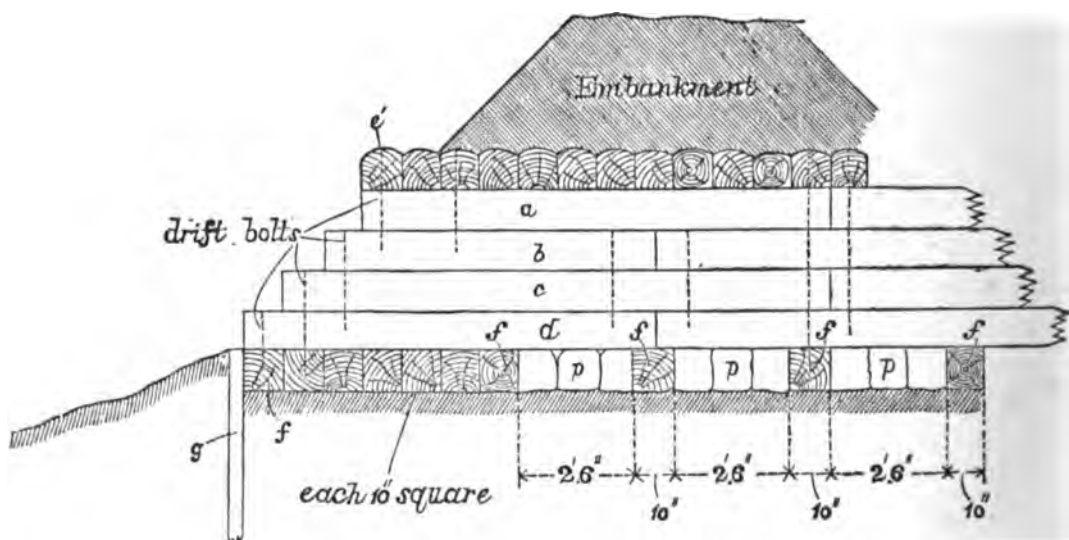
is a part end elevation, and figure 118 part longitudinal section of a timber log culvert used on the Canadian Pacific Railway. The sides of the culvert are made of logs 10 inches square in section, a and c are 12½ feet long, b and d 8½ feet long, d is notched 1 inch deep into the floor logs. These logs are drift bolted together through two logs and into a third. The top of the culvert is formed of roughly squared logs (10" × 10") notched 1 inch on to the side and partition walls. Uprights h are placed at intervals of 10 feet along the length of the culvert and fastened with 1 inch bolts to the logs a and d. The floor is made of cross logs f, f placed at intervals of 2½ feet (except near the end of the culvert, which is formed of logs placed close together) and the spaces between are filled in with stone paving p, p. The dotted lines in figure 118 passing through the logs a, b, c, and d, are drift-bolts. (Scale ¼".) From "Engineering," published 13th December, 1895.
